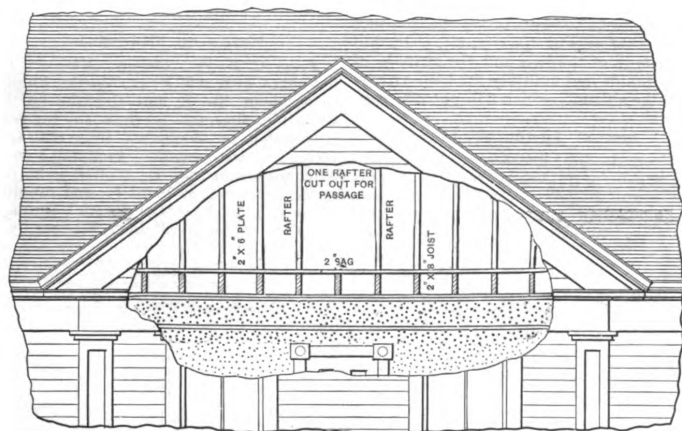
Bad Construction, Showing Sag in Ceiling-Joists.—Scale, 3-16 Inch to the Foot.
